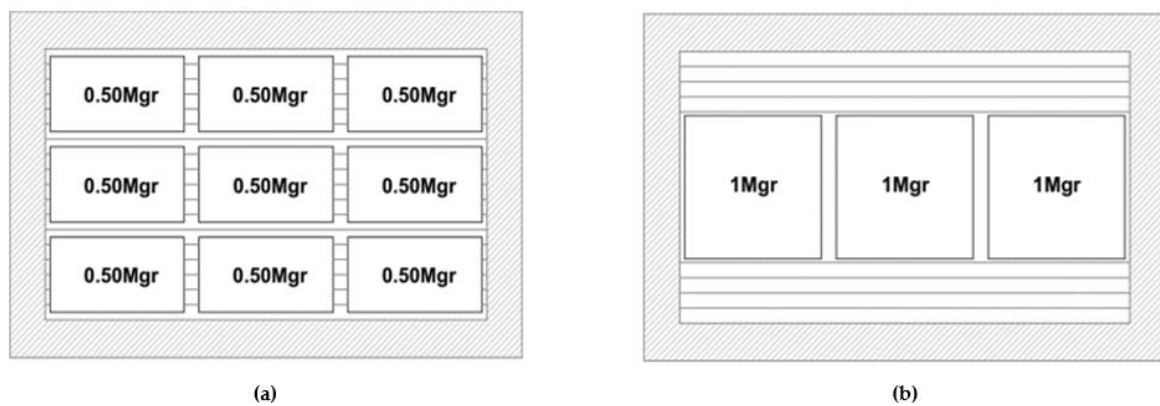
Arrangement of additional masses: (a) 1st floor and (b) 2nd floor.
